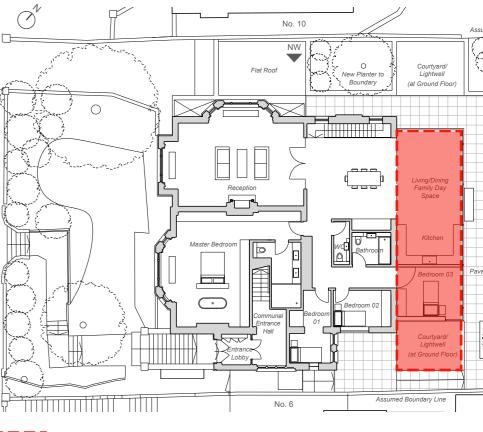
Basement Plan - from Planning Application 2014/3625 P
